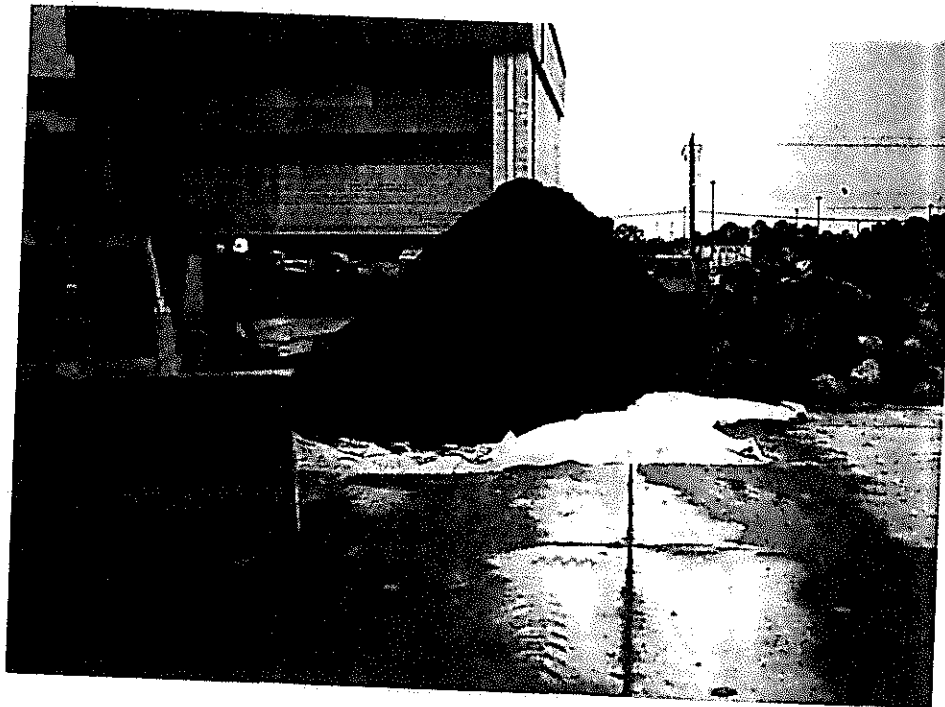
Pile of petroleum contaminated soils at the site of the excavation.
